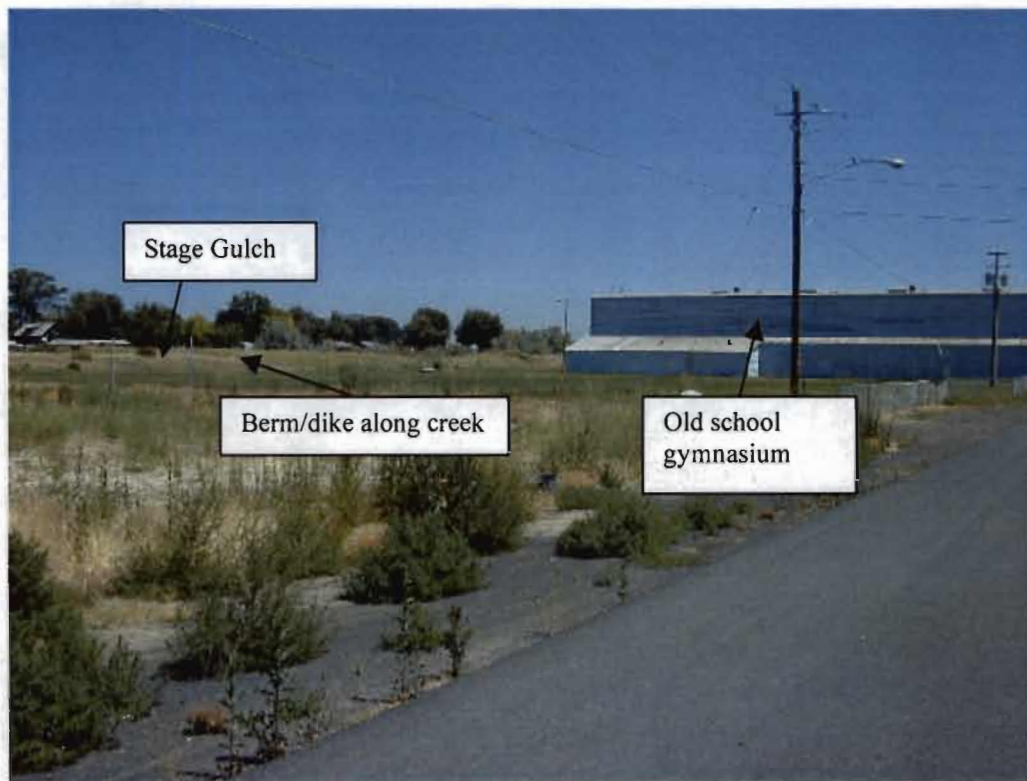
View looks northeast (upstream) at old school used as a church, located immediately south of Stage Gulch.
